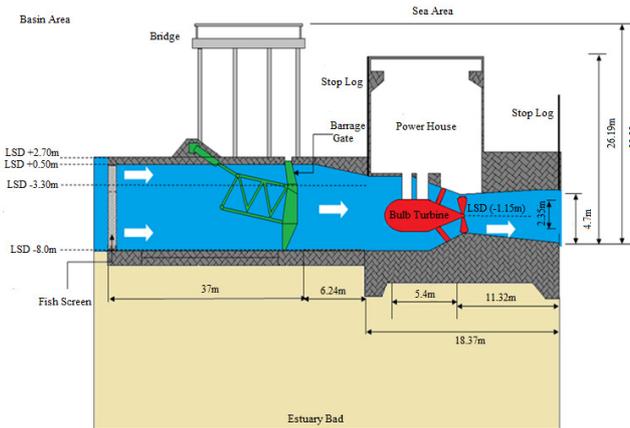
Powerhouse layout of Kuching Barrage tidal energy plant.
